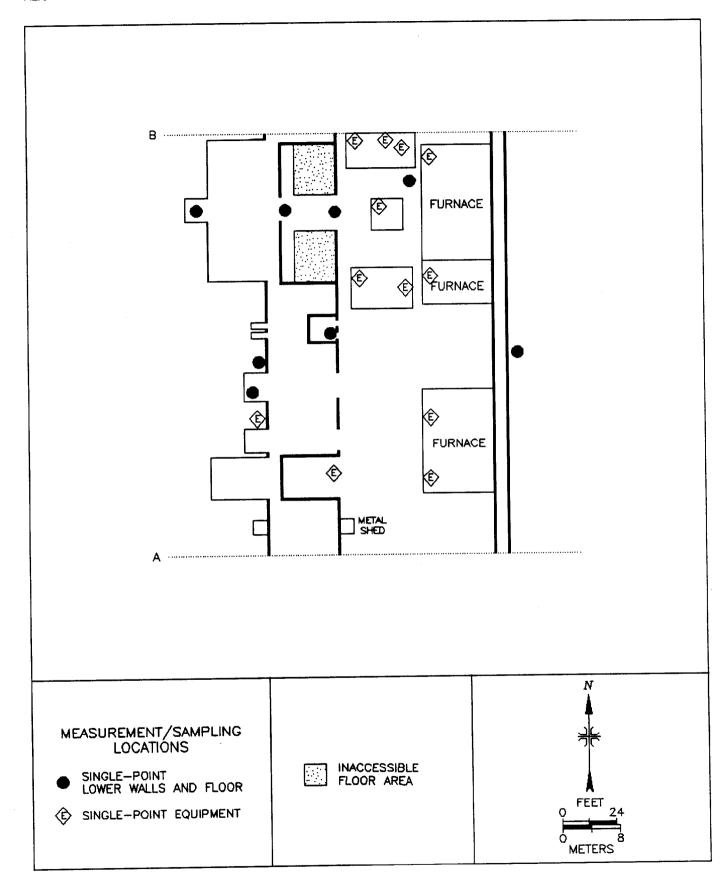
Building 1, Section B — Measurement and Sampling Locations
